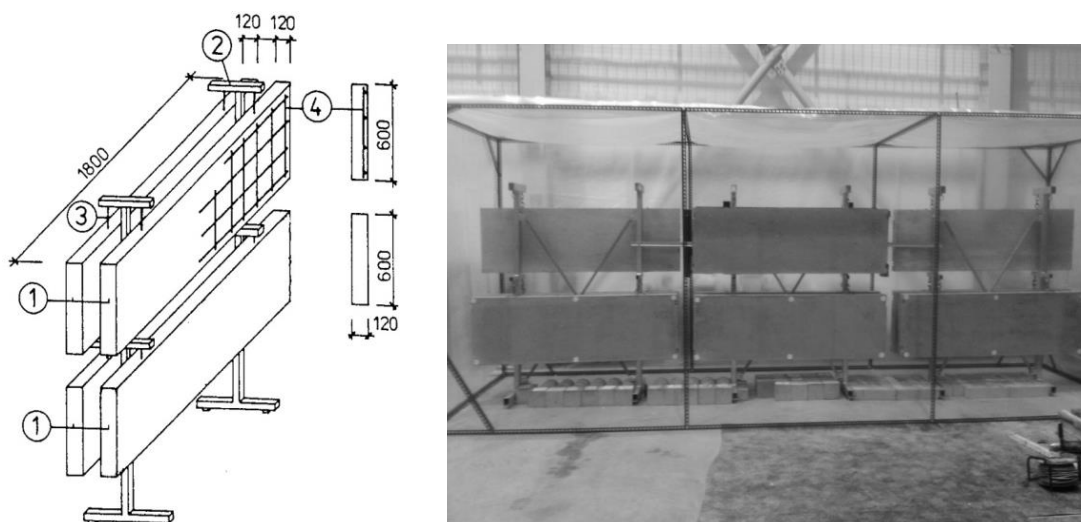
Storage of specimens: 1- concrete slabs, 2- stand, 3- hang up, 4- slab reinforcement
